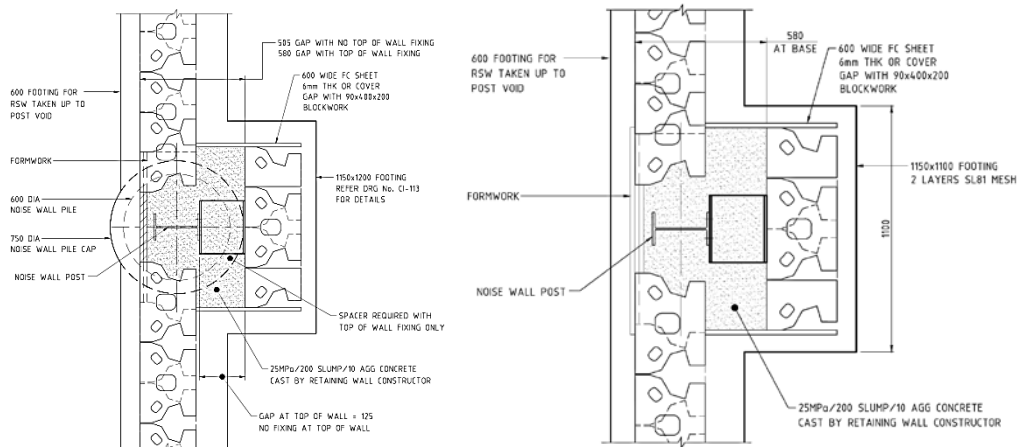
Accommodation of Noise Barrier Posts in Masonry Faced Reinforced Soil Wall
